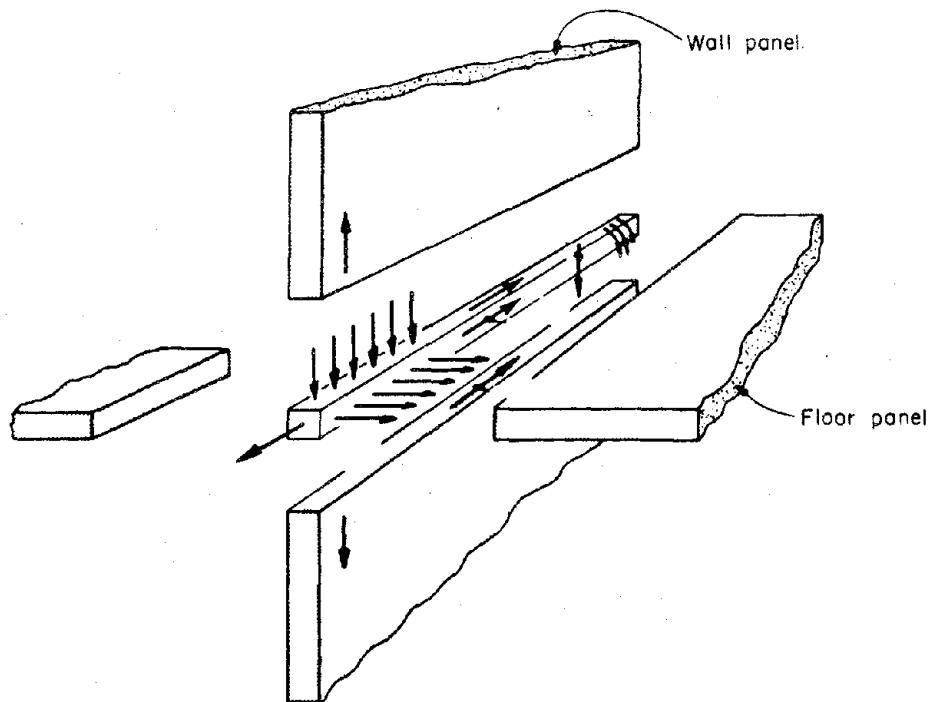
FORCES ON TYPICAL HORIZONTAL JOINT [32]
